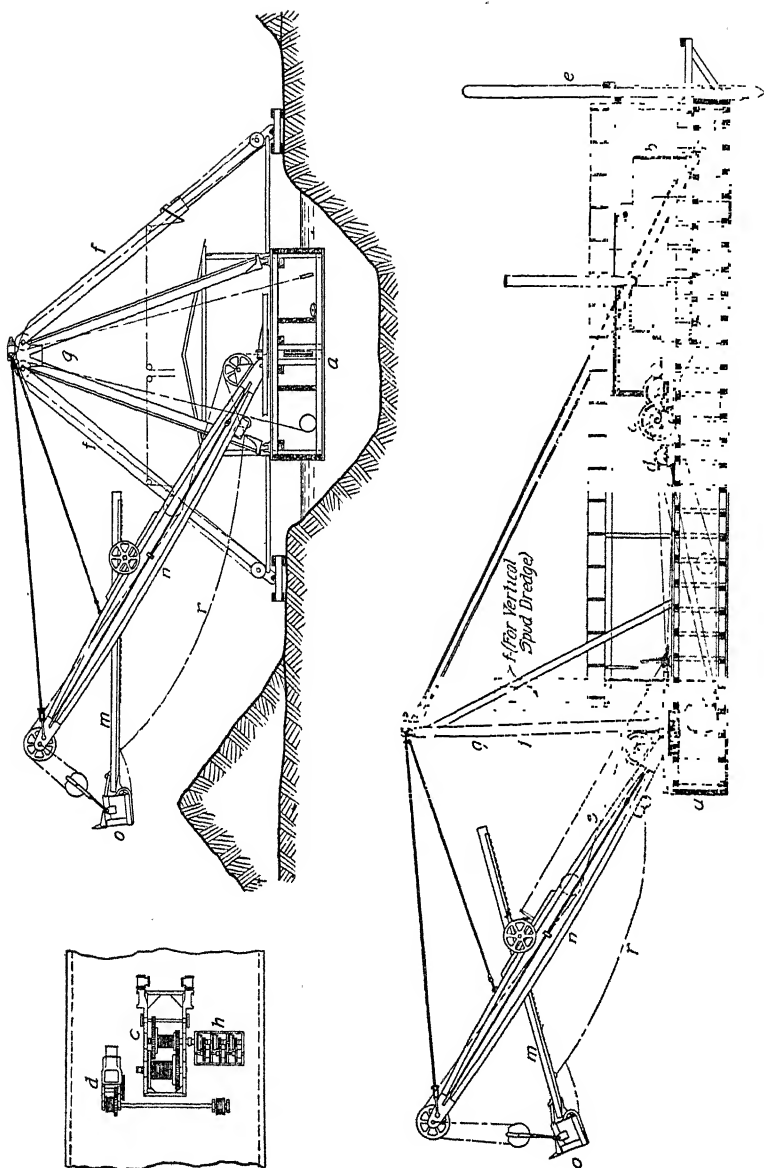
Diagram of Ditching Dredge with Bank Spuds. a, Hull; b, Boiler; c, Main Engine; d, Spading Engine; e, Rear Spud; f, Side Spud; g, A-Frame; h, Spud Hoist; i, Dipper Handle; m, Boom; o, Dipper; r, Backing Table; s, Hoisting Table
